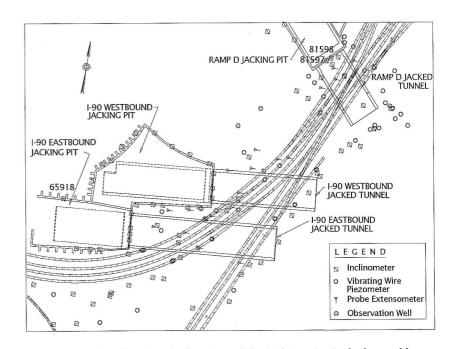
Site plan showing the location of the jacking pits, jacked tunnel boxes and geotechnical instrumentation.
